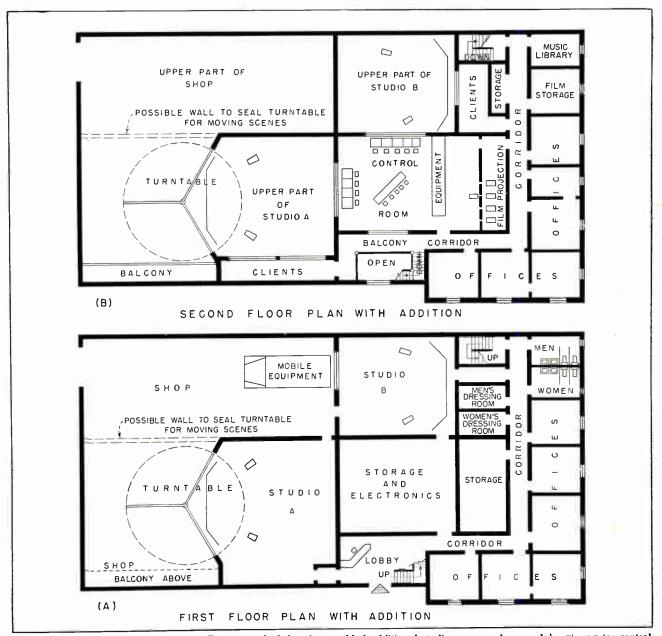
The minimum station shown in Fig. 1, to which has been added additional studio space and more elaborate master control equipment
